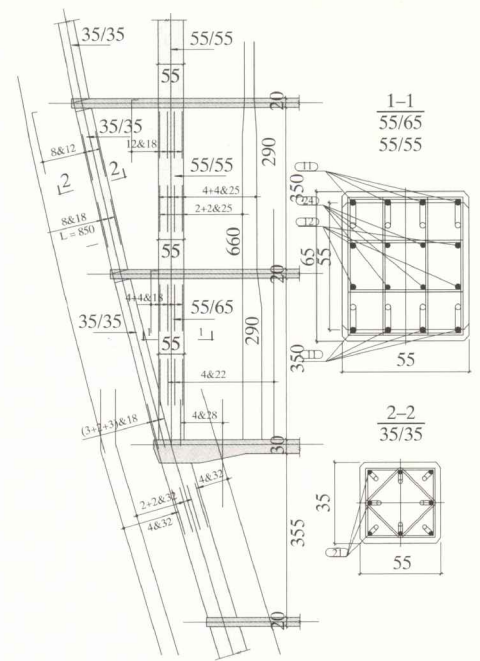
Intersection point of the sloped columns, the rounded edge beam and the new interior column which is added at the 8th floor
